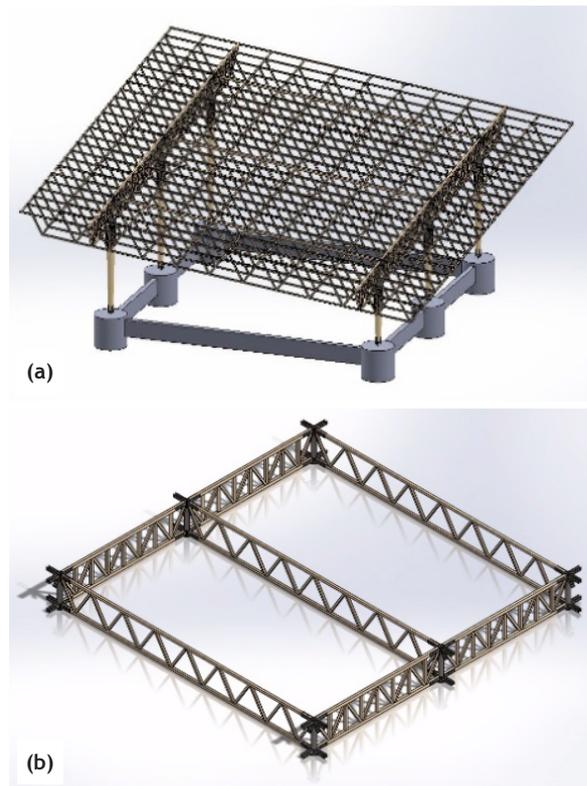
(a) Timber structure on buried concrete foundation. (b) Main frame comprises two longitudinal and three lateral trusses.
